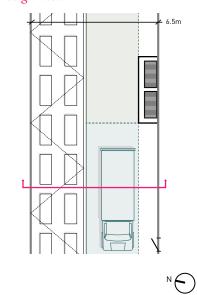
Design Idea 3; Enlarged Plan, plan
